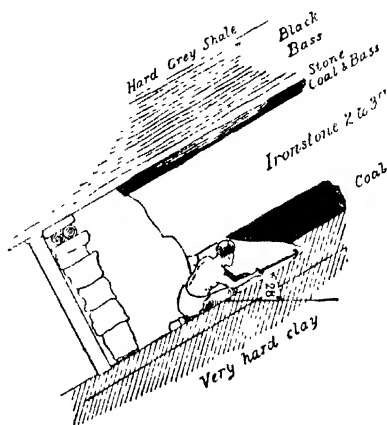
Stone pillar supporting the roof of a working place, Staffordshire.
